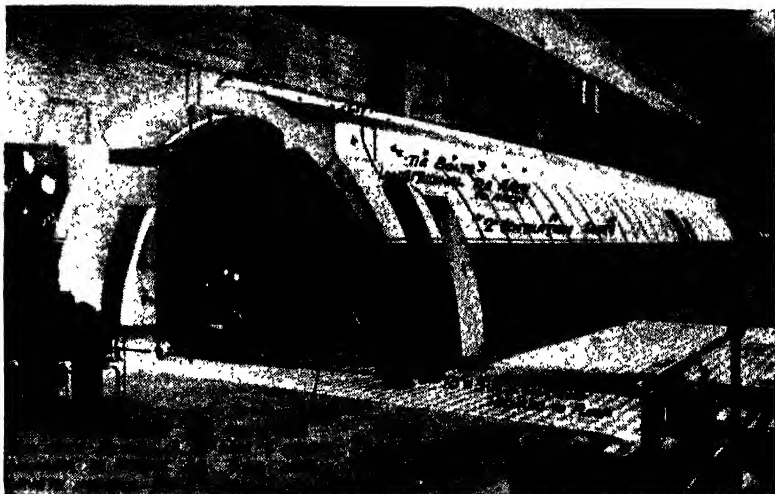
Reinforced Concrete Blast and Splinter Protection for 20 MW Turbo-Alternator.
